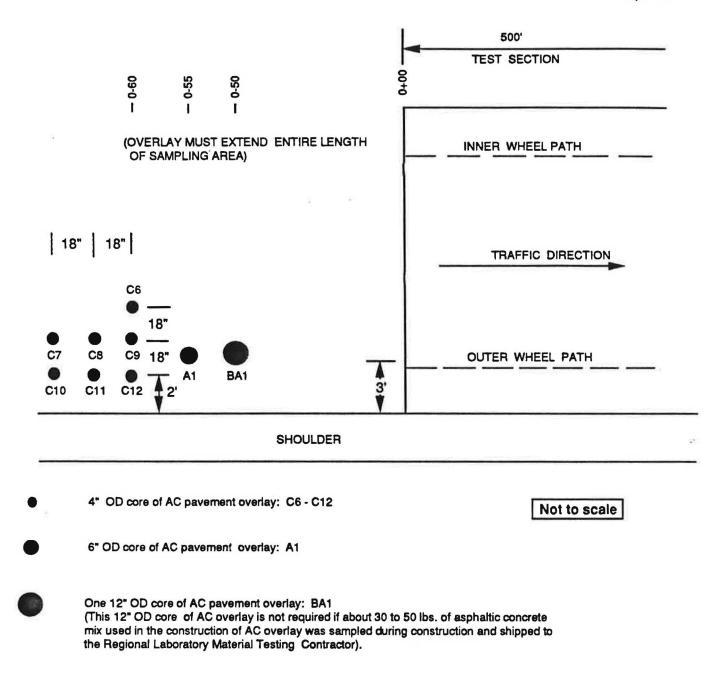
<u>After Overlay</u> Sampling Point Locations Before Test Section, GPS-6 Asphalt Concrete Overlay Over Asphalt Concrete (Alternative Sampling Plan) - Case 2
